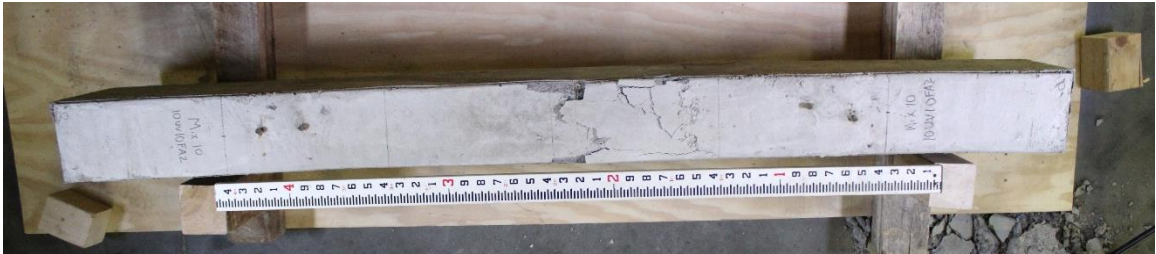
Mixture 10 (10UV10FA2) beam #30: concrete beam top view.
